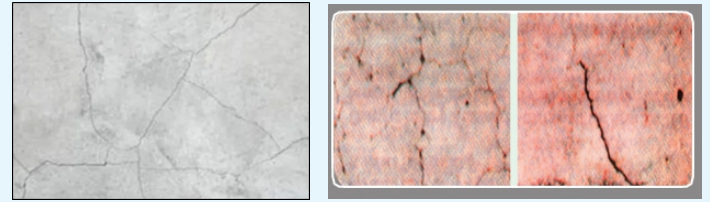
Plastic Shrinkage Cracks in concrete
